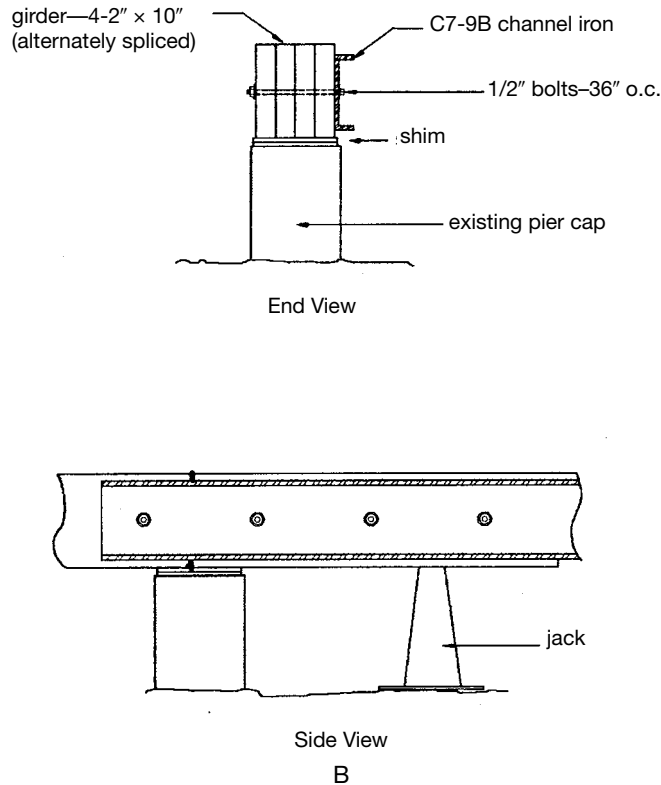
B.1.6. (continued) (B) Installation of channel iron to reinforce wood girders.
